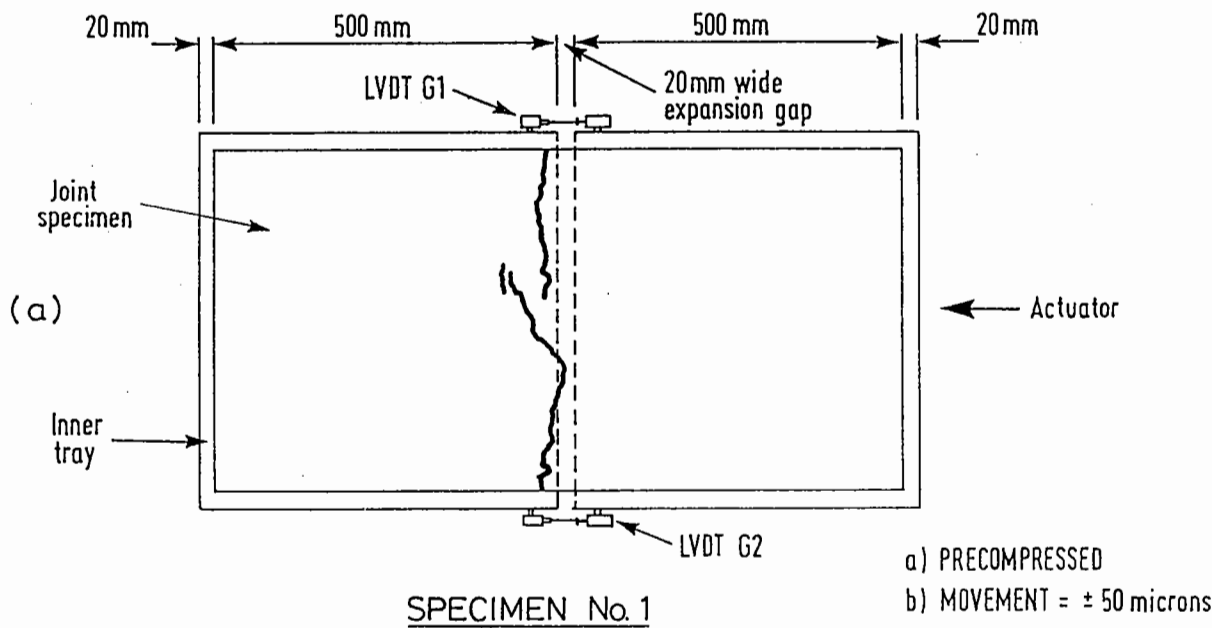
CRACKS INDUCED AT EXPANSION JOINT AFTER FAILURE (SLABS NO. 1 TO 3)
